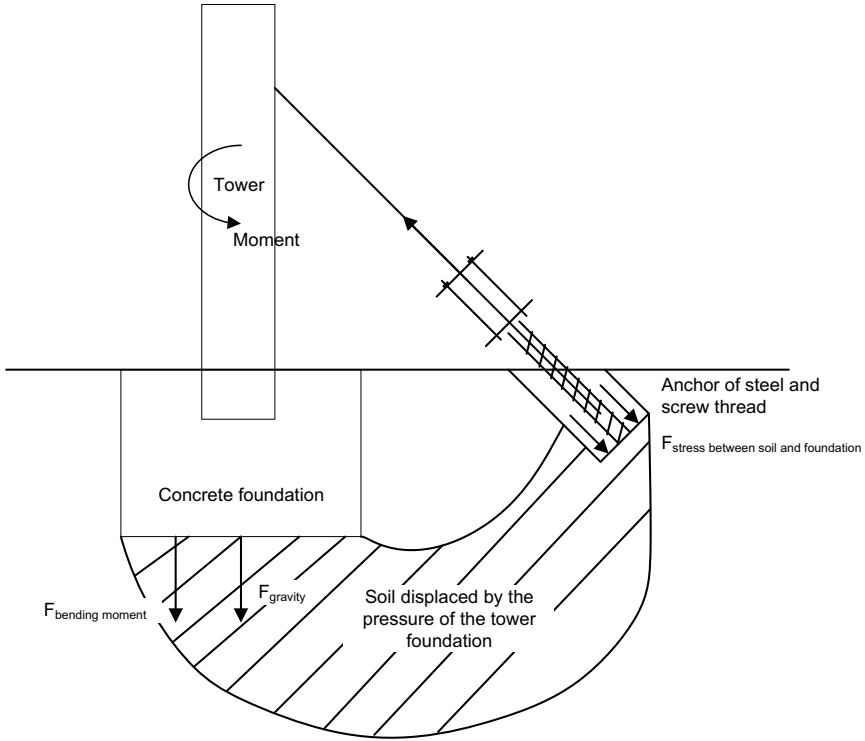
Force flow: guyed tower with anchorage [WETI]
